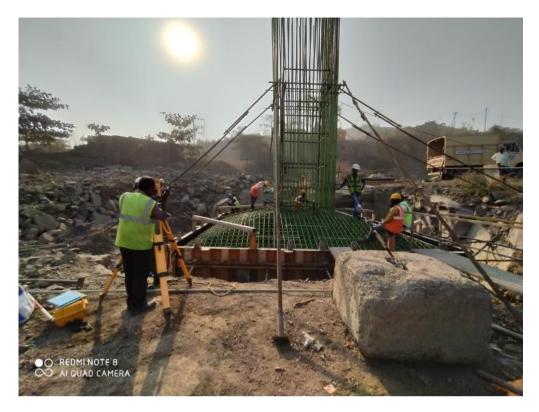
Foundation co-ordinates checking at Jasai area is in progress
